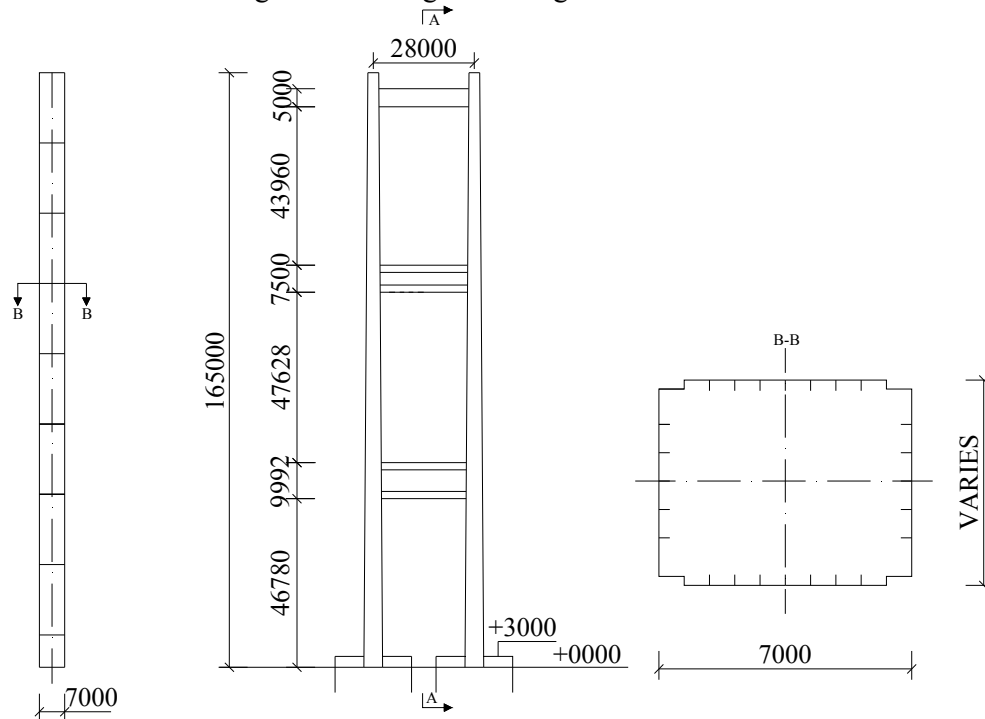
Dimensions of the Bridge Towers (Dimensions as mm)
